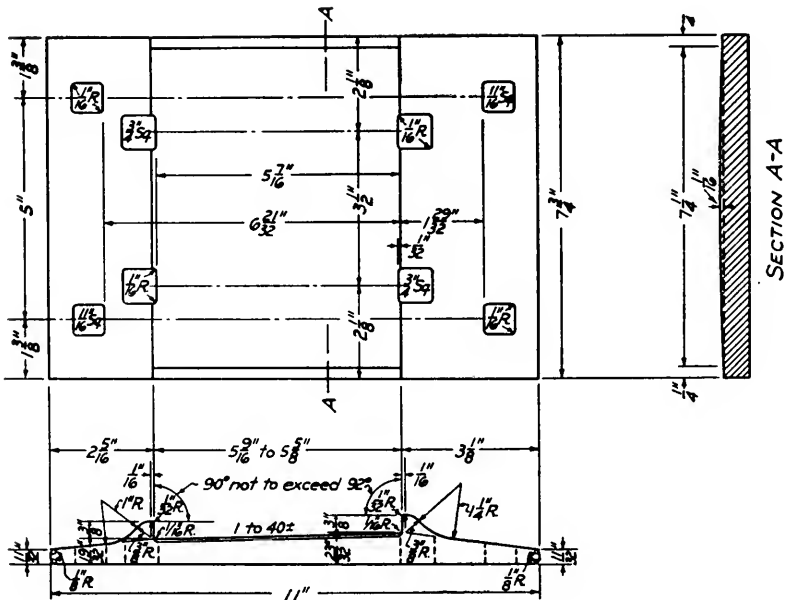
Plan T.P. 400 (AREA Plan No. 2) Test Tie Plate for 112-lb. Rail.
